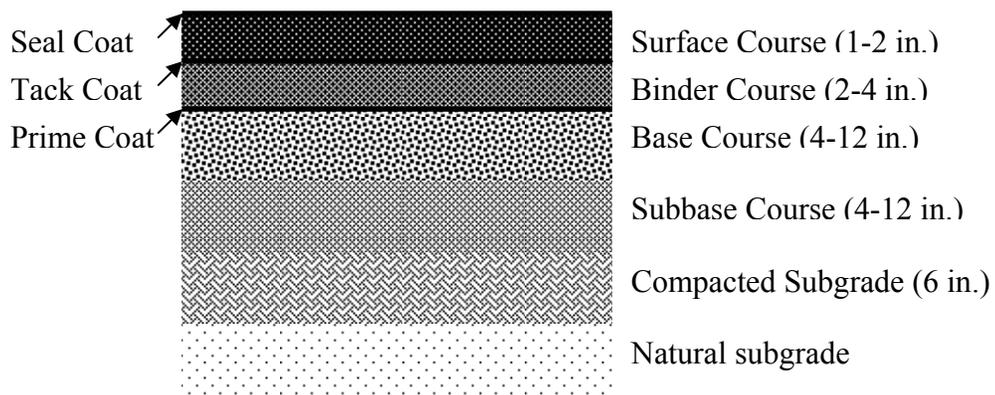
Typical Cross Section of a Conventional Flexible Pavement
